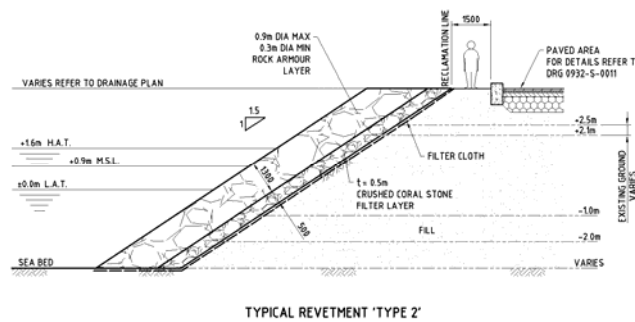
Structure of Seawall Proposed in BF/S
